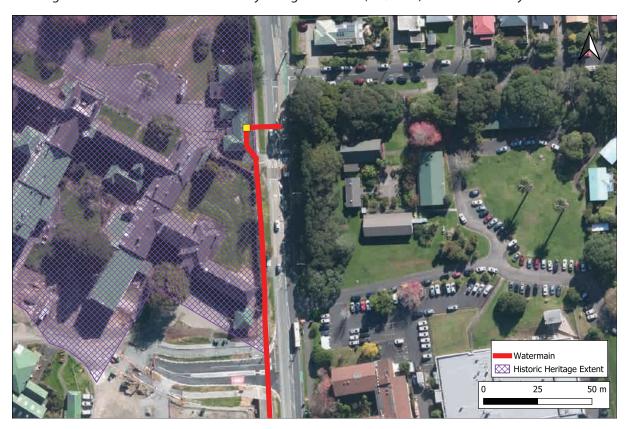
The proposed utilities trench beside the Carrington Hospital main building (R11/3561).
